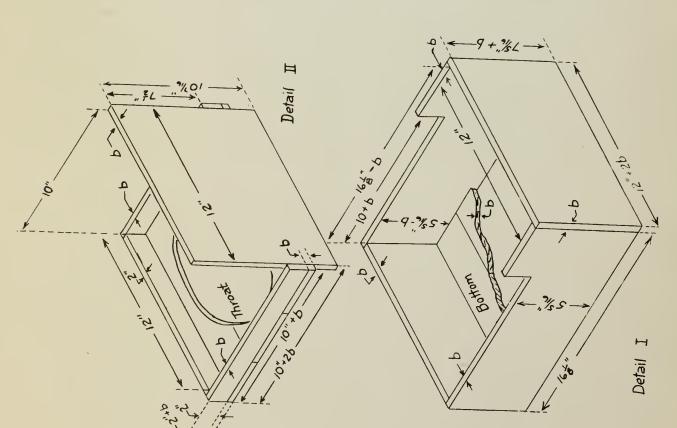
Bottom (detail I) and throat (detail sections of meter.
